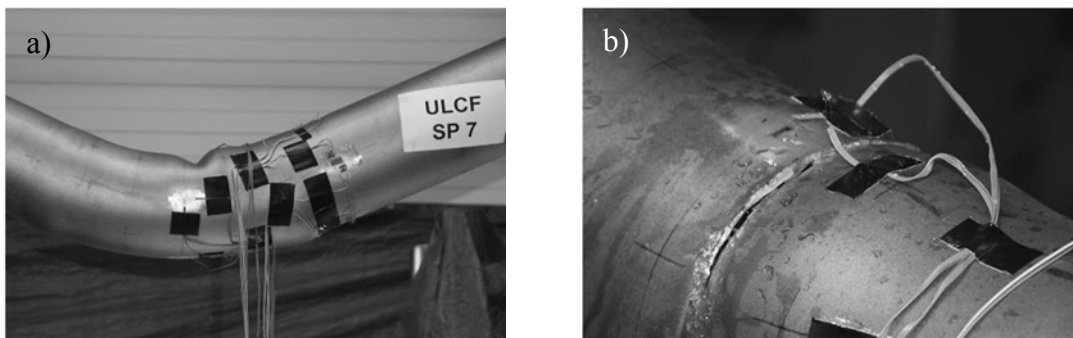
Failure aspect of SP7 specimen: a) buckle detail; b) detail of the crack at the end of the test.
